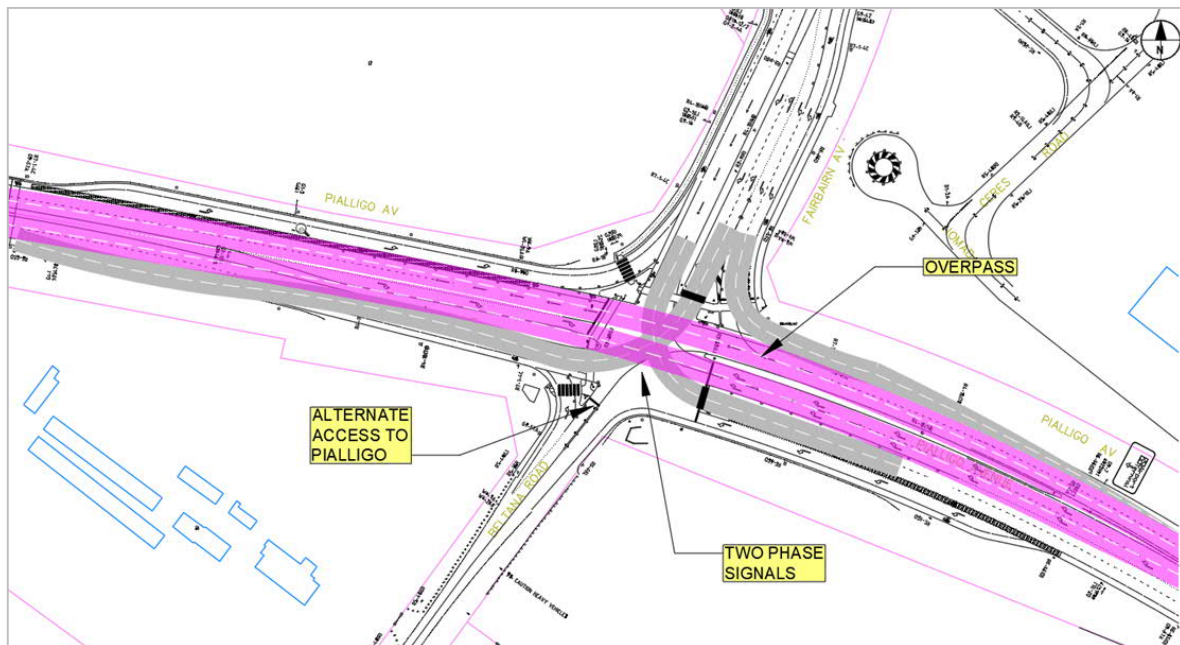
Option 12-3 Grade separation at the Pialligo Avenue/Fairbairn Avenue intersection, including the removal of the Beltana Road connection to Pialligo Avenue
